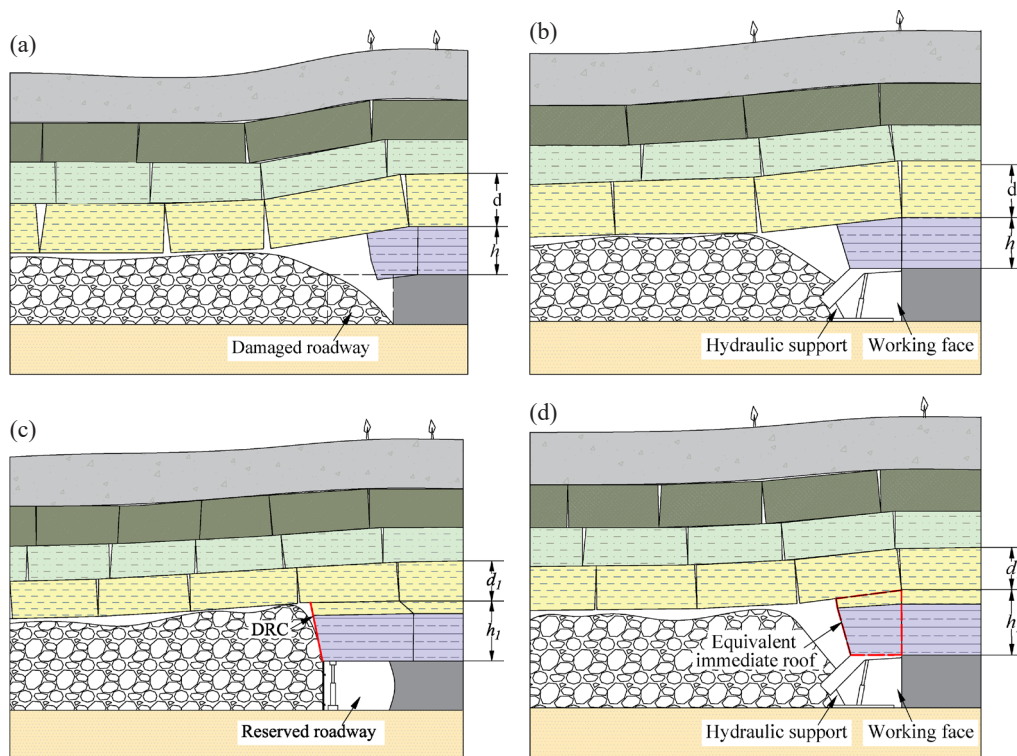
Mechanism Model of DRC technology (a) The section of roadway with non-DRC technology, (b) The section of working face with non-DRC technology, (c) The section of roadway with DRC technology, (d) The section of working face with DRC technology
